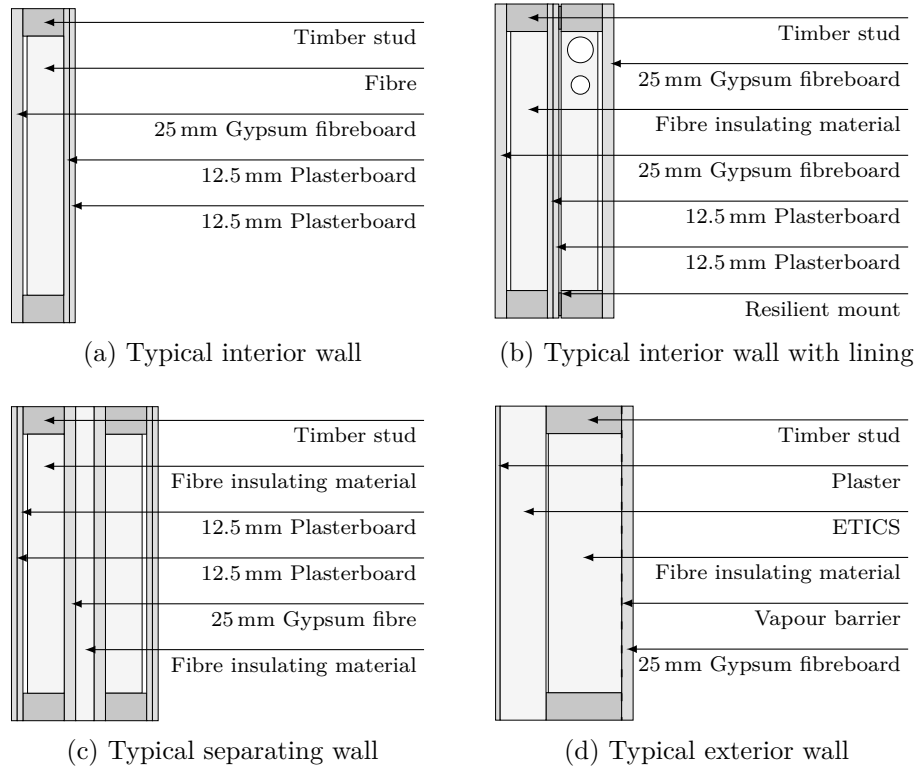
Field test structures. Examples of typical wall constructions in timber-frame buildings.
